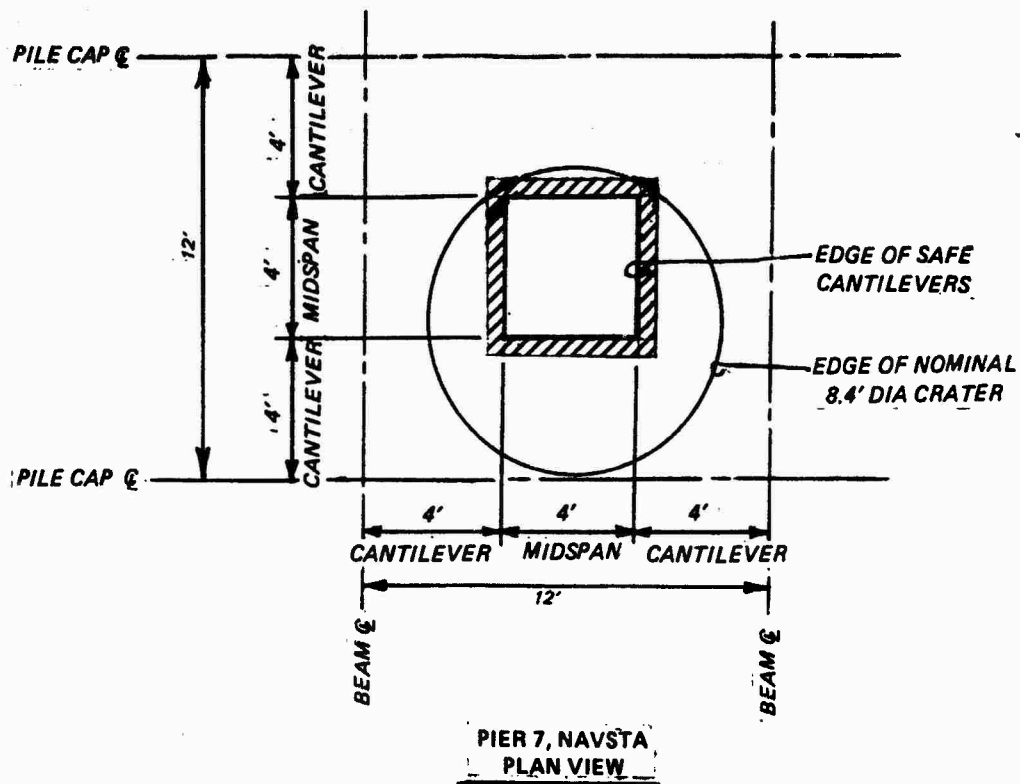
Impossibility of Case 2 damage, NAVSTA Piers 7 and 10
